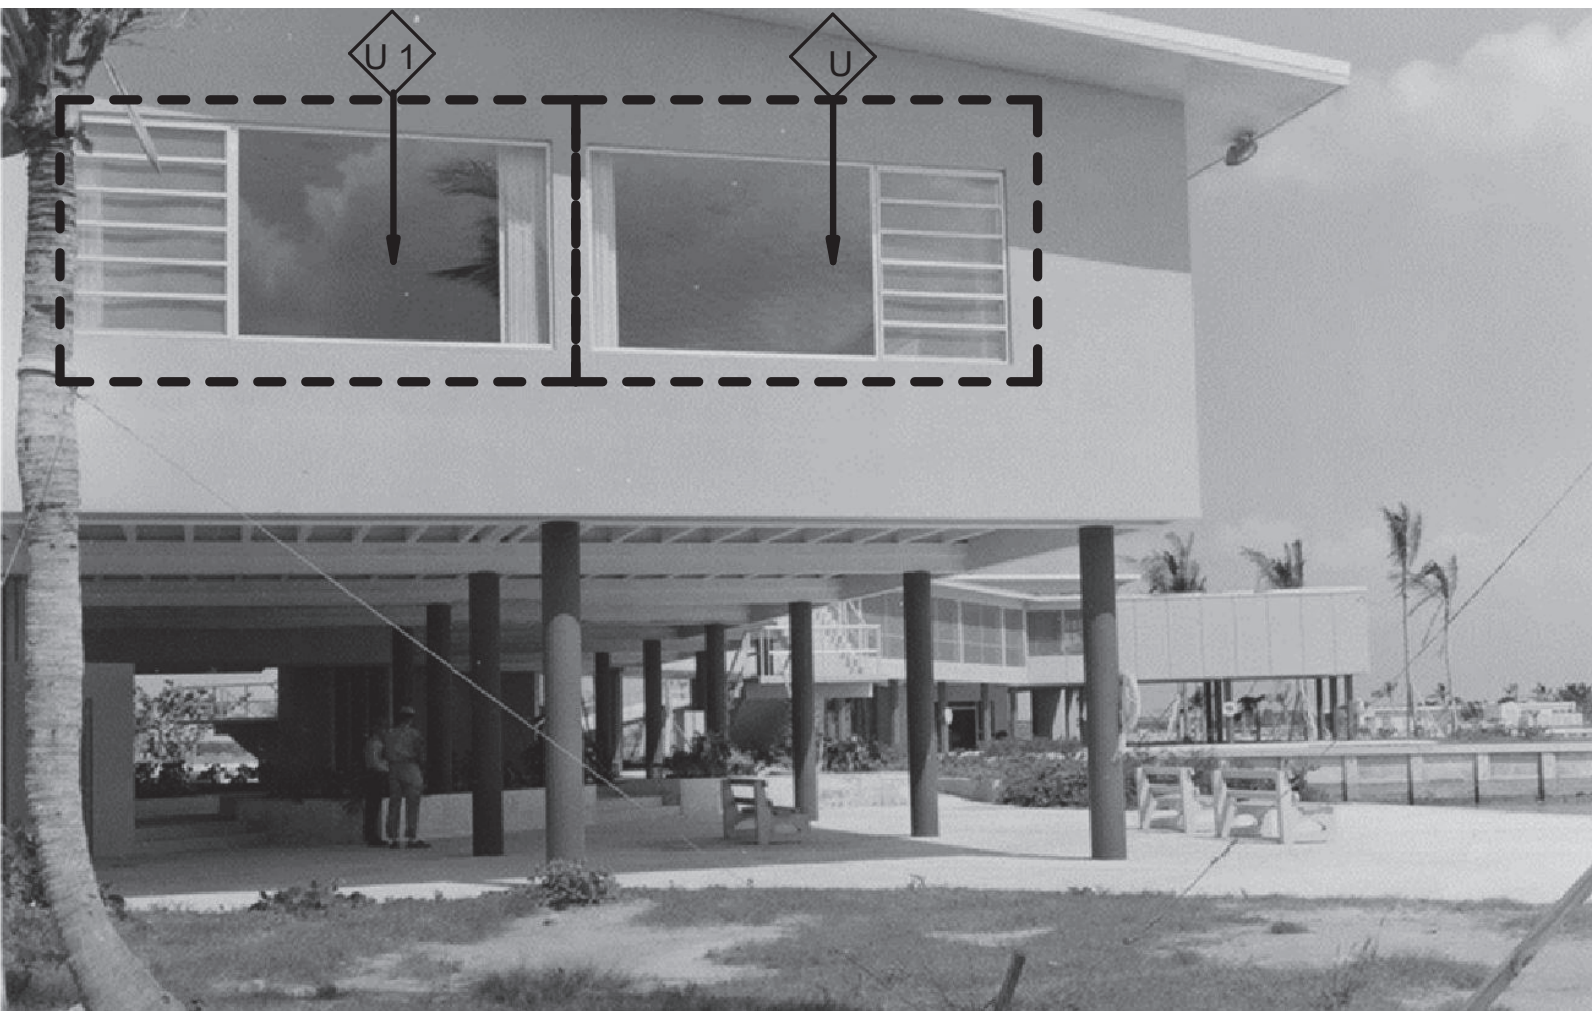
SOUTH SIDE ELEVATION OF VISITOR CENTER WITH THE ORIGINAL WINDOWS (1959)
